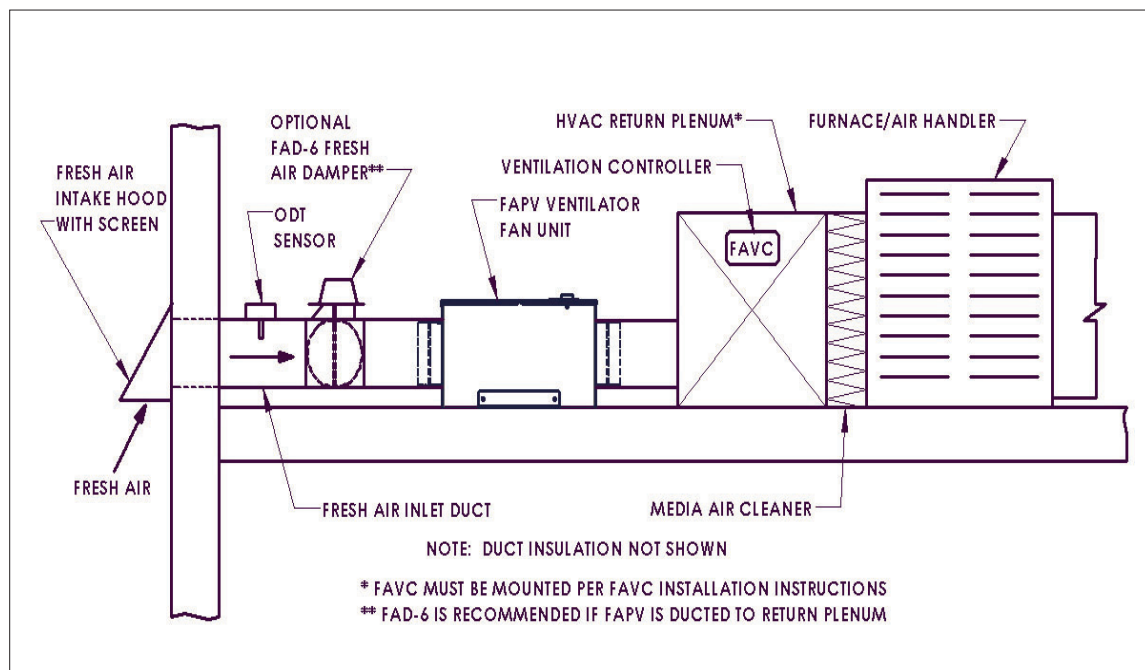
HVAC PLENUM TYPICAL INSTALLATION
